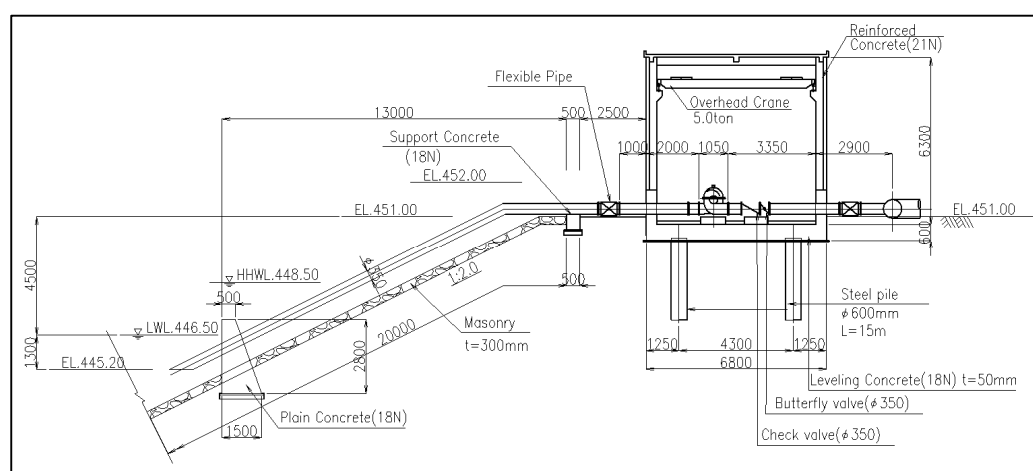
Plan and Section of Pump Station Building (Profile)
